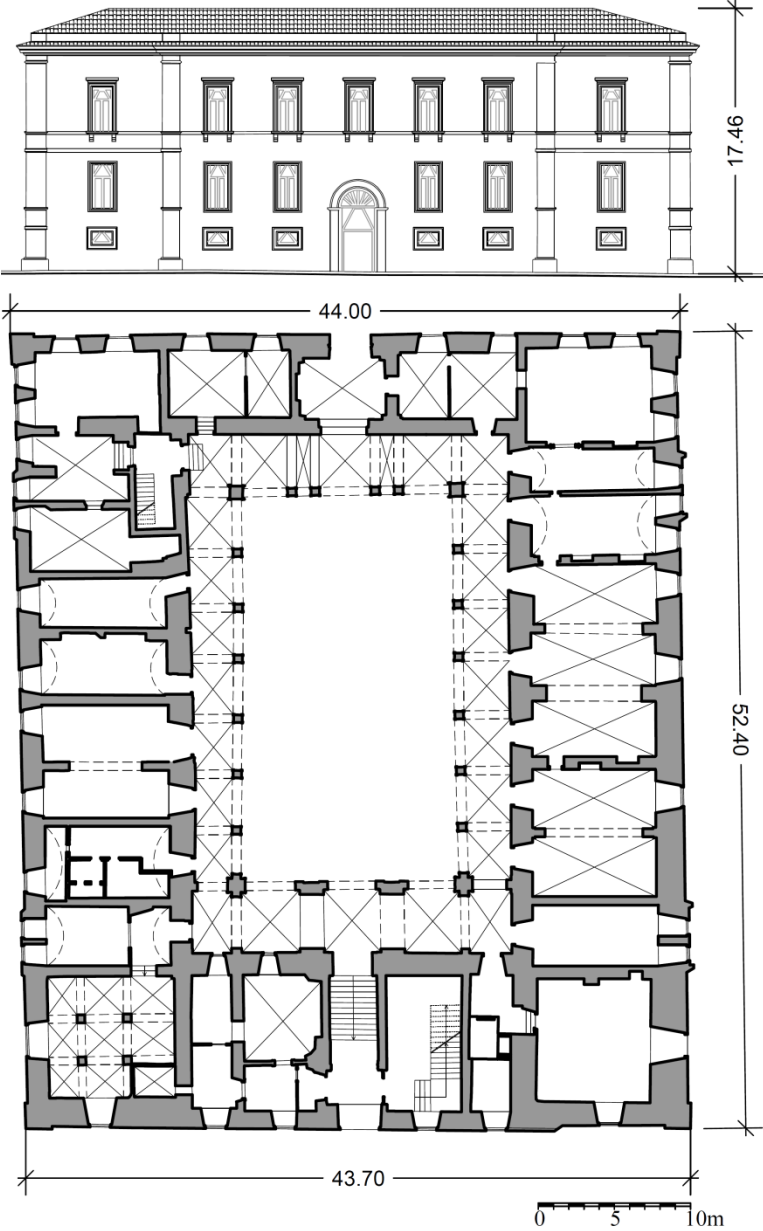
De Amicis school*: frontal view and plan of the first floor
